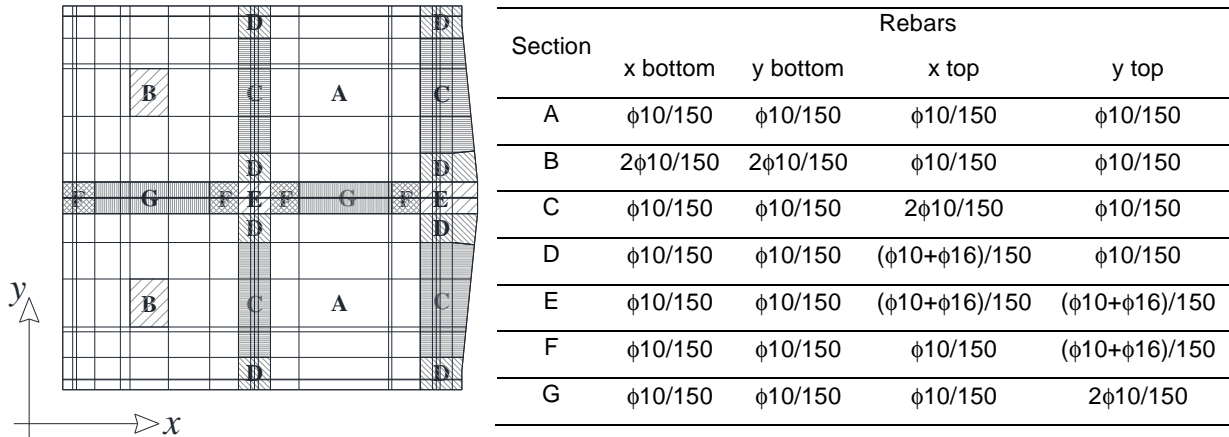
'Symmetric' structure. (a) Concrete slab partitions; (b) slab section properties (measures in mm)
